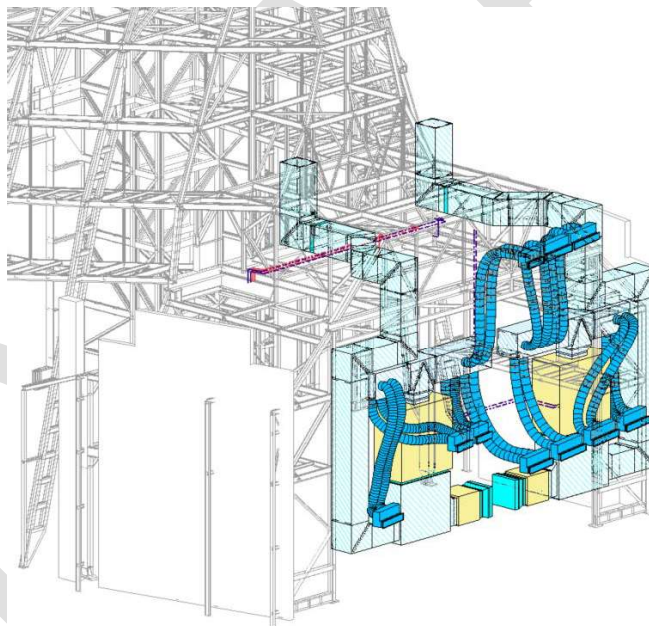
New Plantroom 22 Mechanical Units and Ductwork
